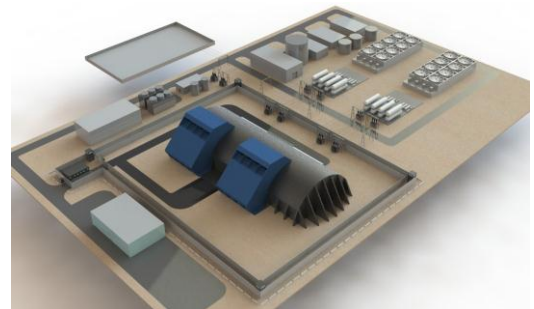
Site plan for baseline, four-unit 1060 MWe plant
